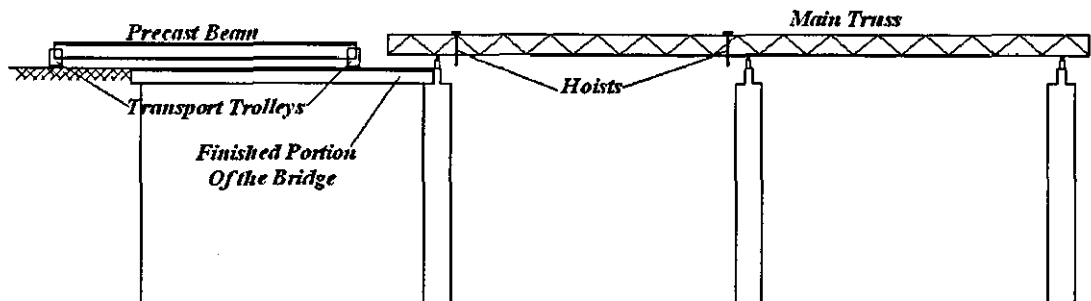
A precast beam transported to the launching trusses (DSI, 1995)
